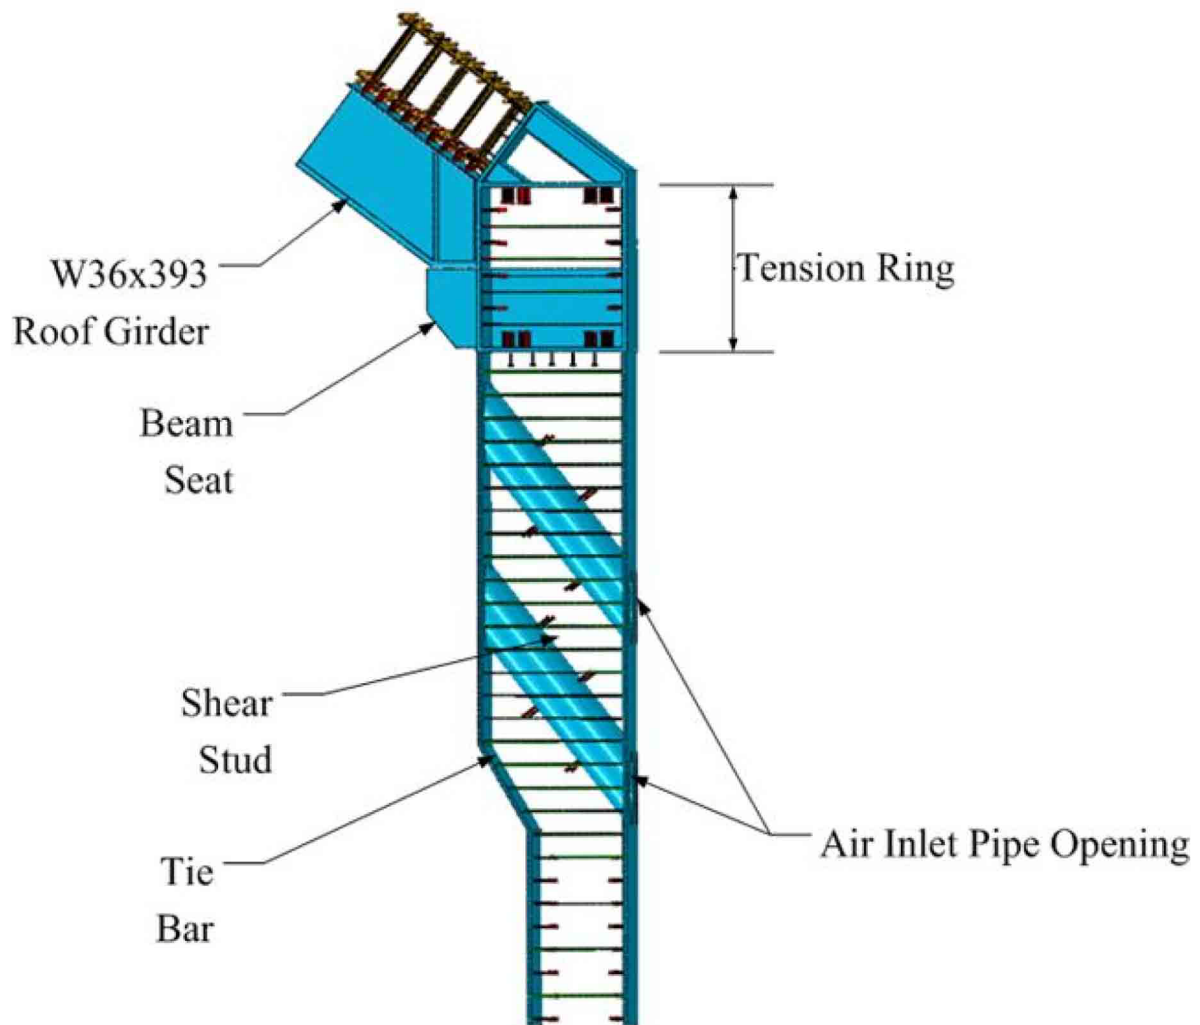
H.5-14 Elevation View of Tension Ring and Air Inlets
